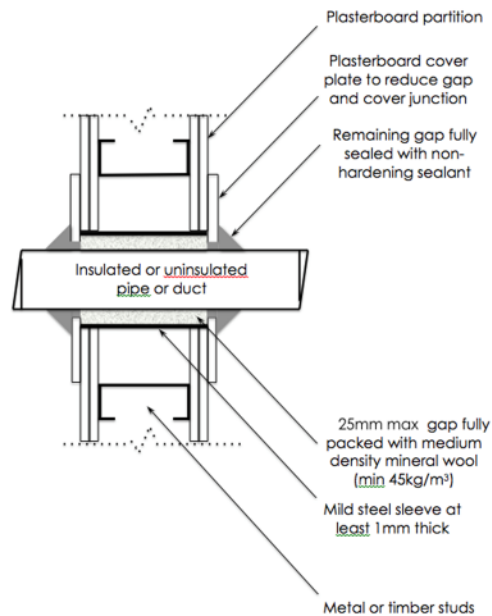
Penetration Details – Dry Walls – with Cover Plates
